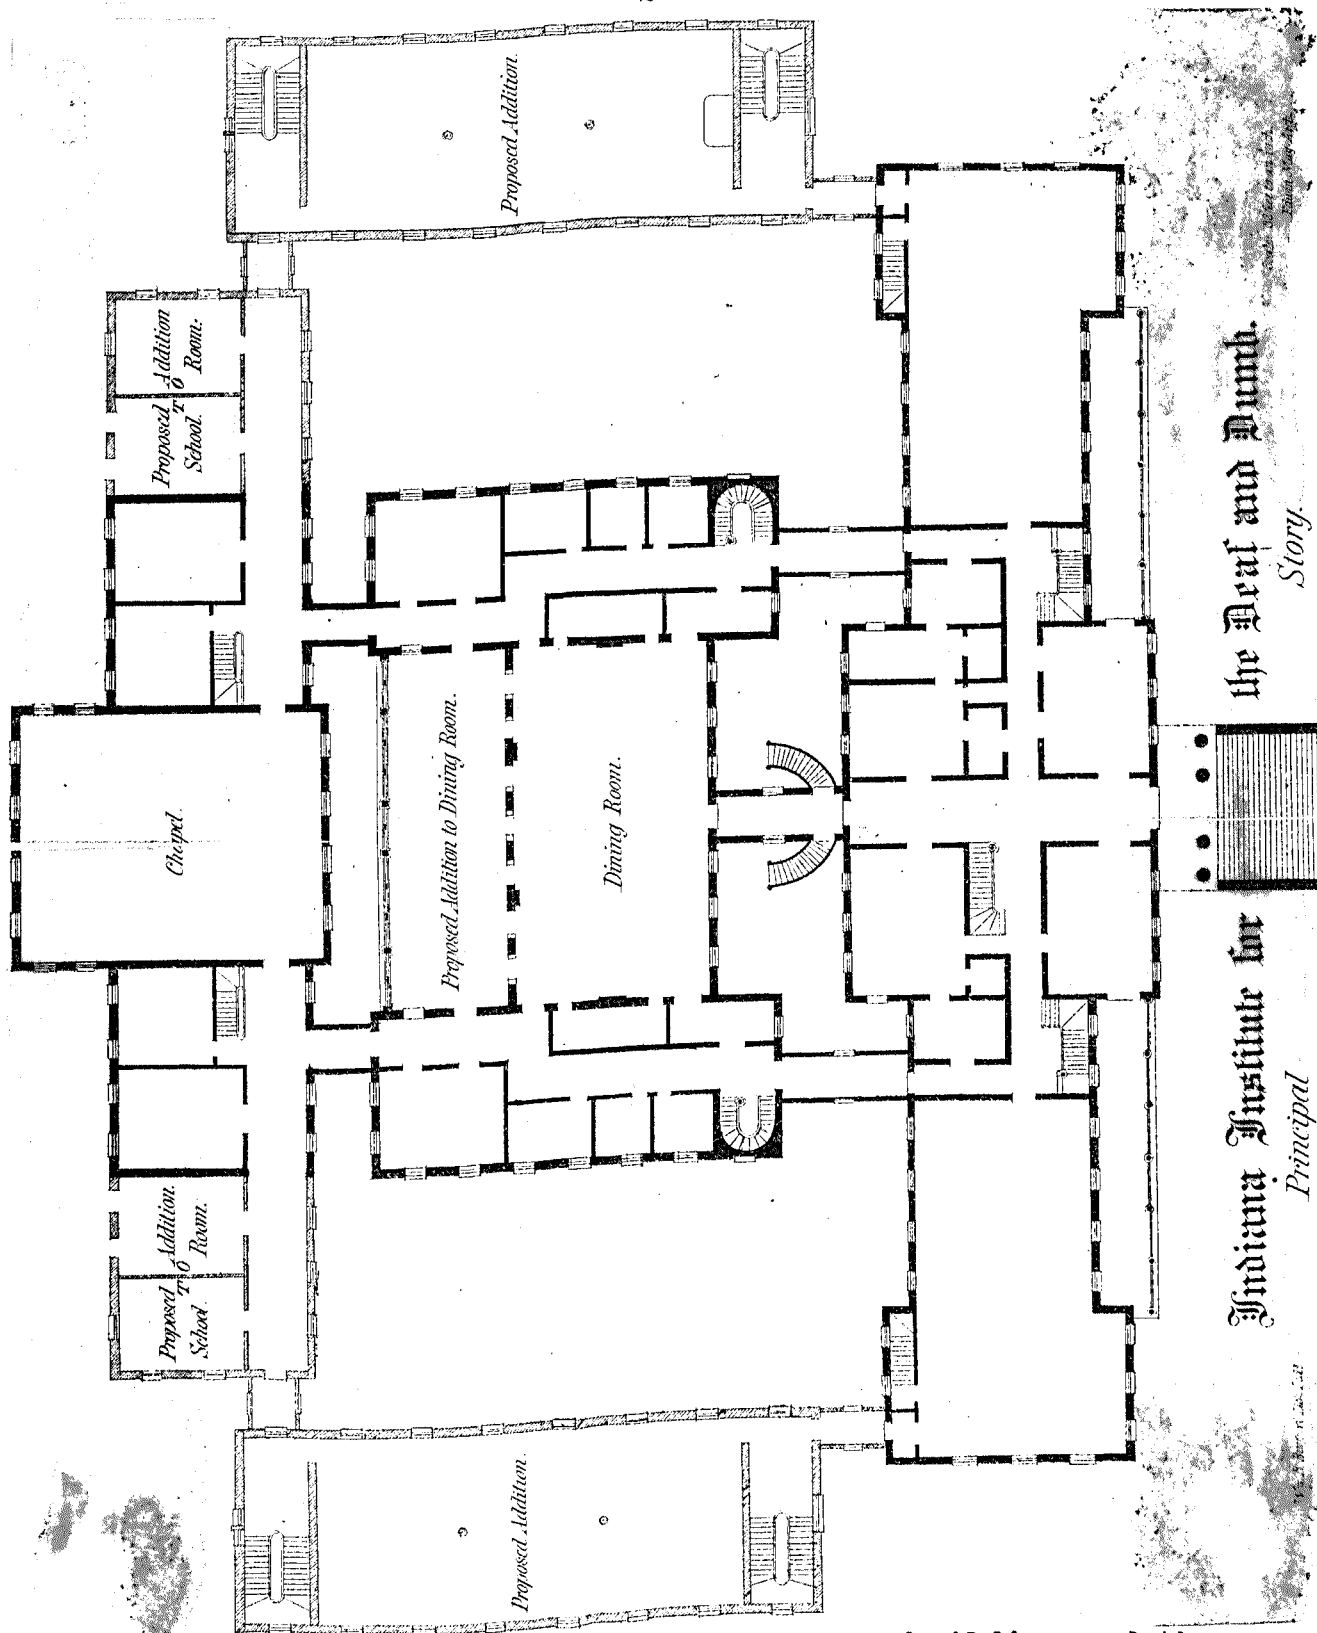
first floor of the main building and the school building, 1850-1911.
